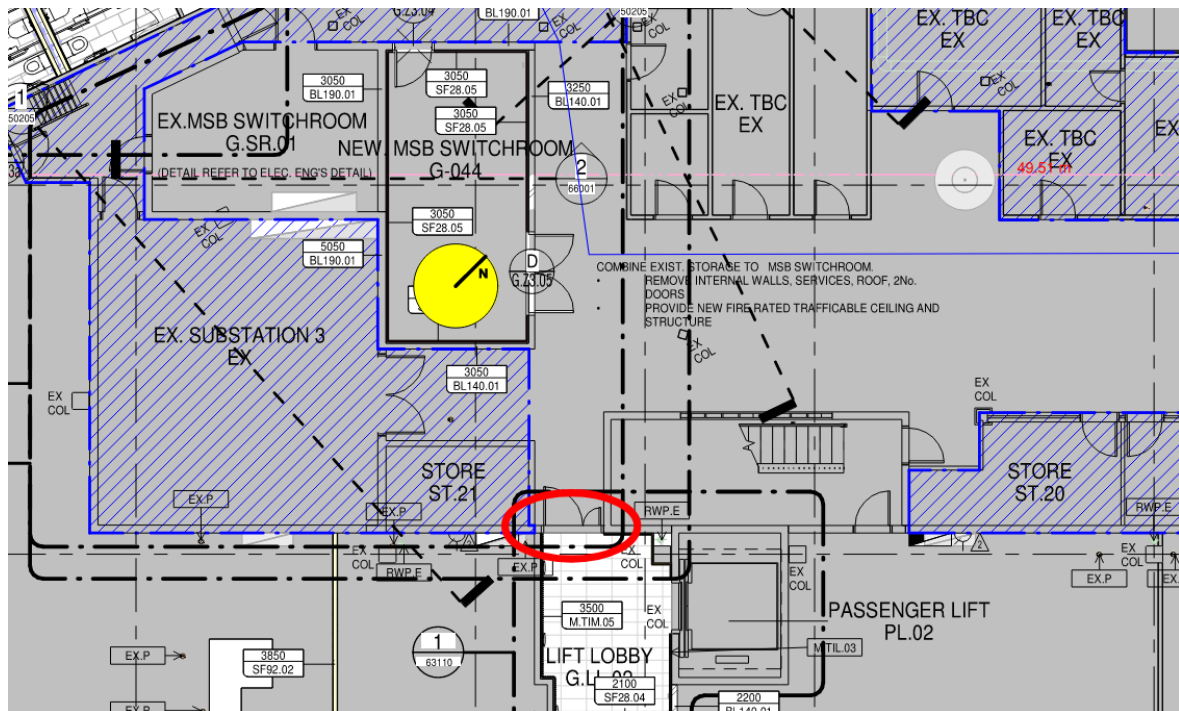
Existing door leading to the western BoH that shall be provided with re-entry
